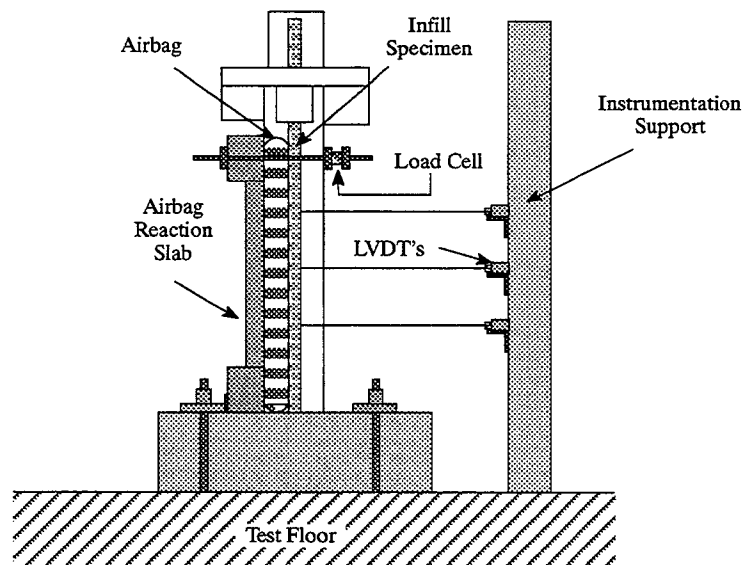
Elevation of Overall Out-of-Plane Test Setup
